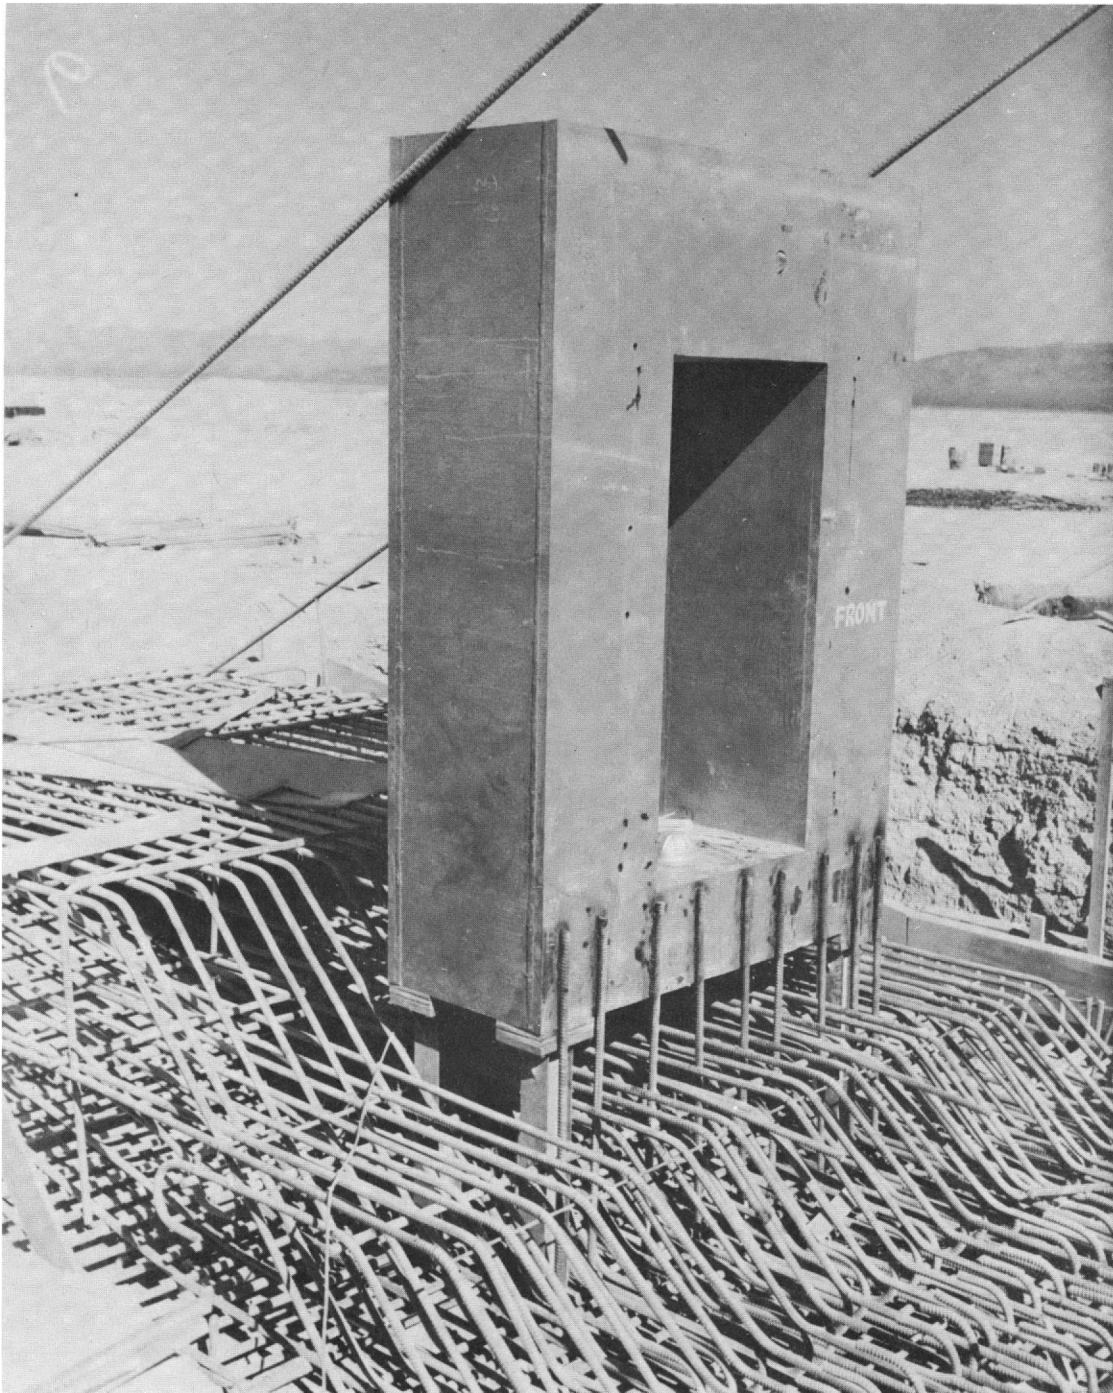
Base slab with door frame in place. Note wind bracing.
